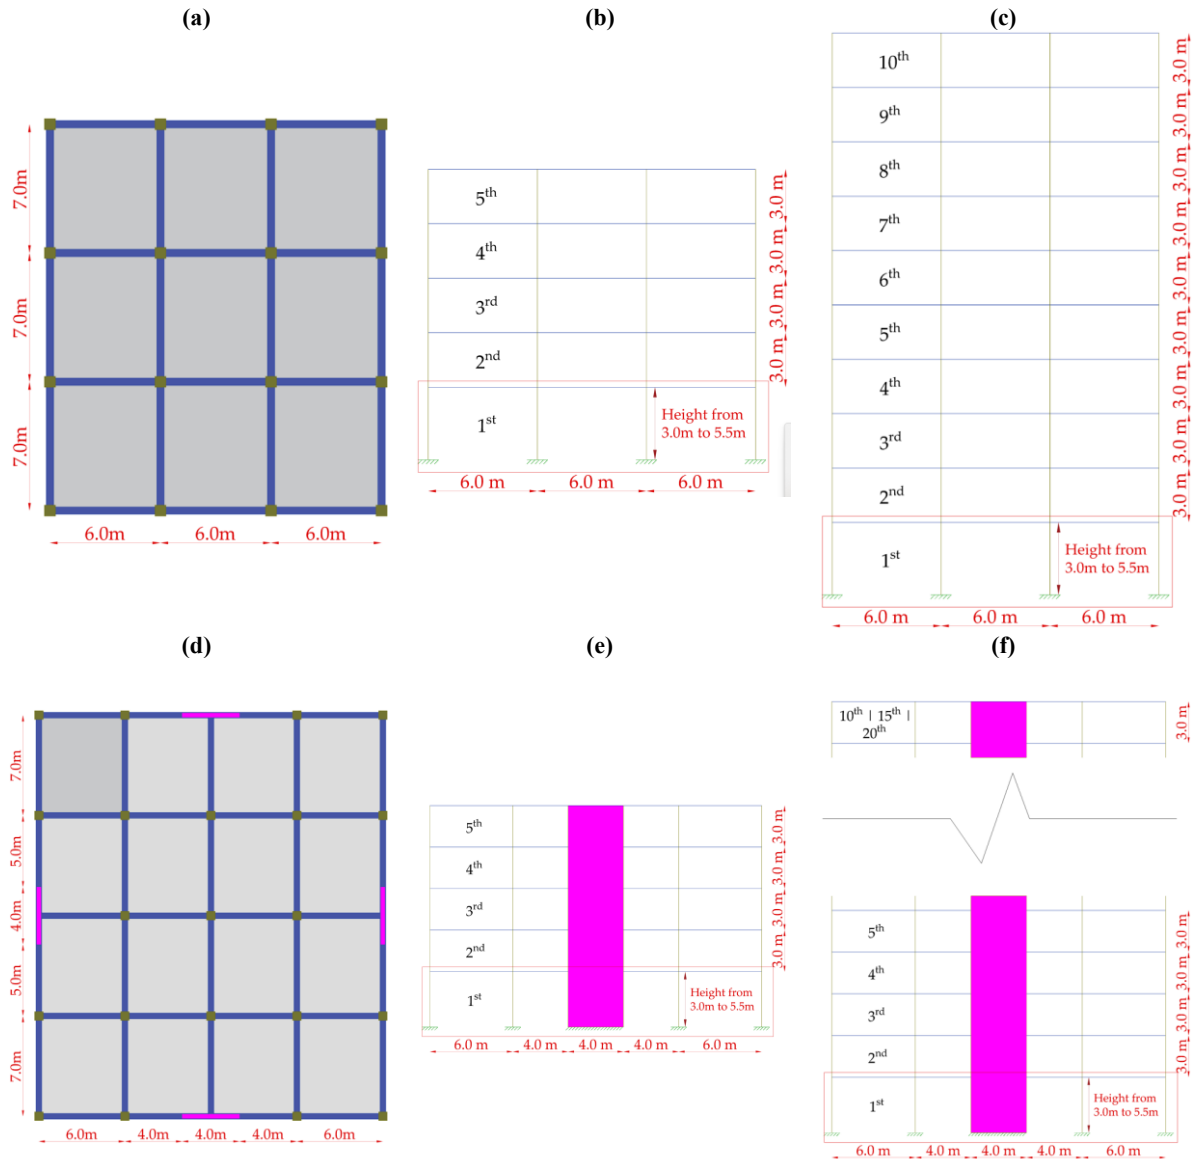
(a) Planview of MRF structures; (b) cutaway of 5-storey MRF structures; (c) cutaway of 10-storey MRF structures; (d) planview of wall structures; (e) cutaway of 5-storey wall structures and (f) cutaway of 10, 15 and 20-storey wall structures
